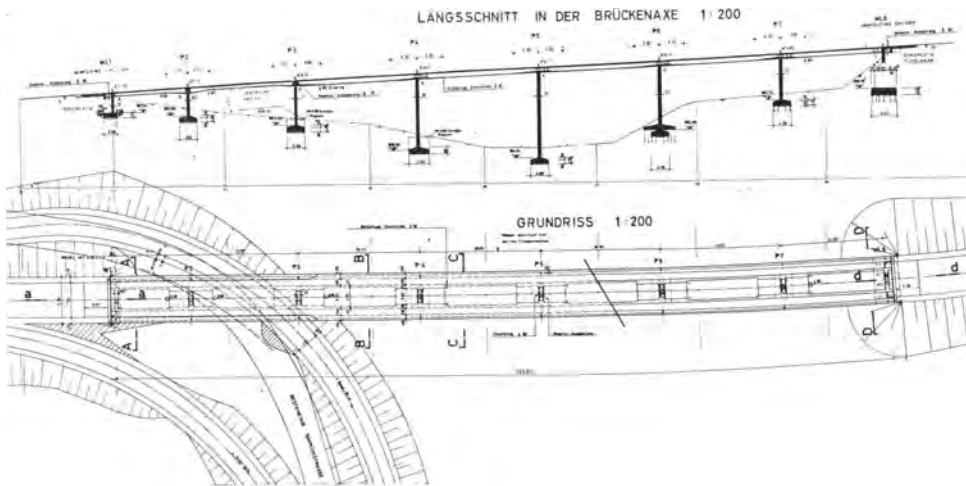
Structure of the Chritzi Bridge before the repair [1]. Longitudinal section in the bridge axis 1:200 (scale); Situation 1:200
